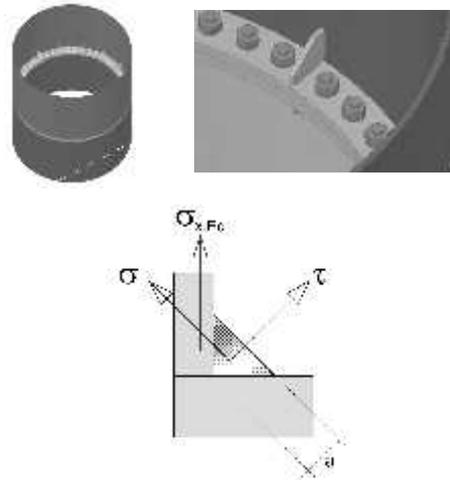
(a) *Segment joint – view*; (b) *Welded joint between steel shell element and the endplate of the bolted connection
